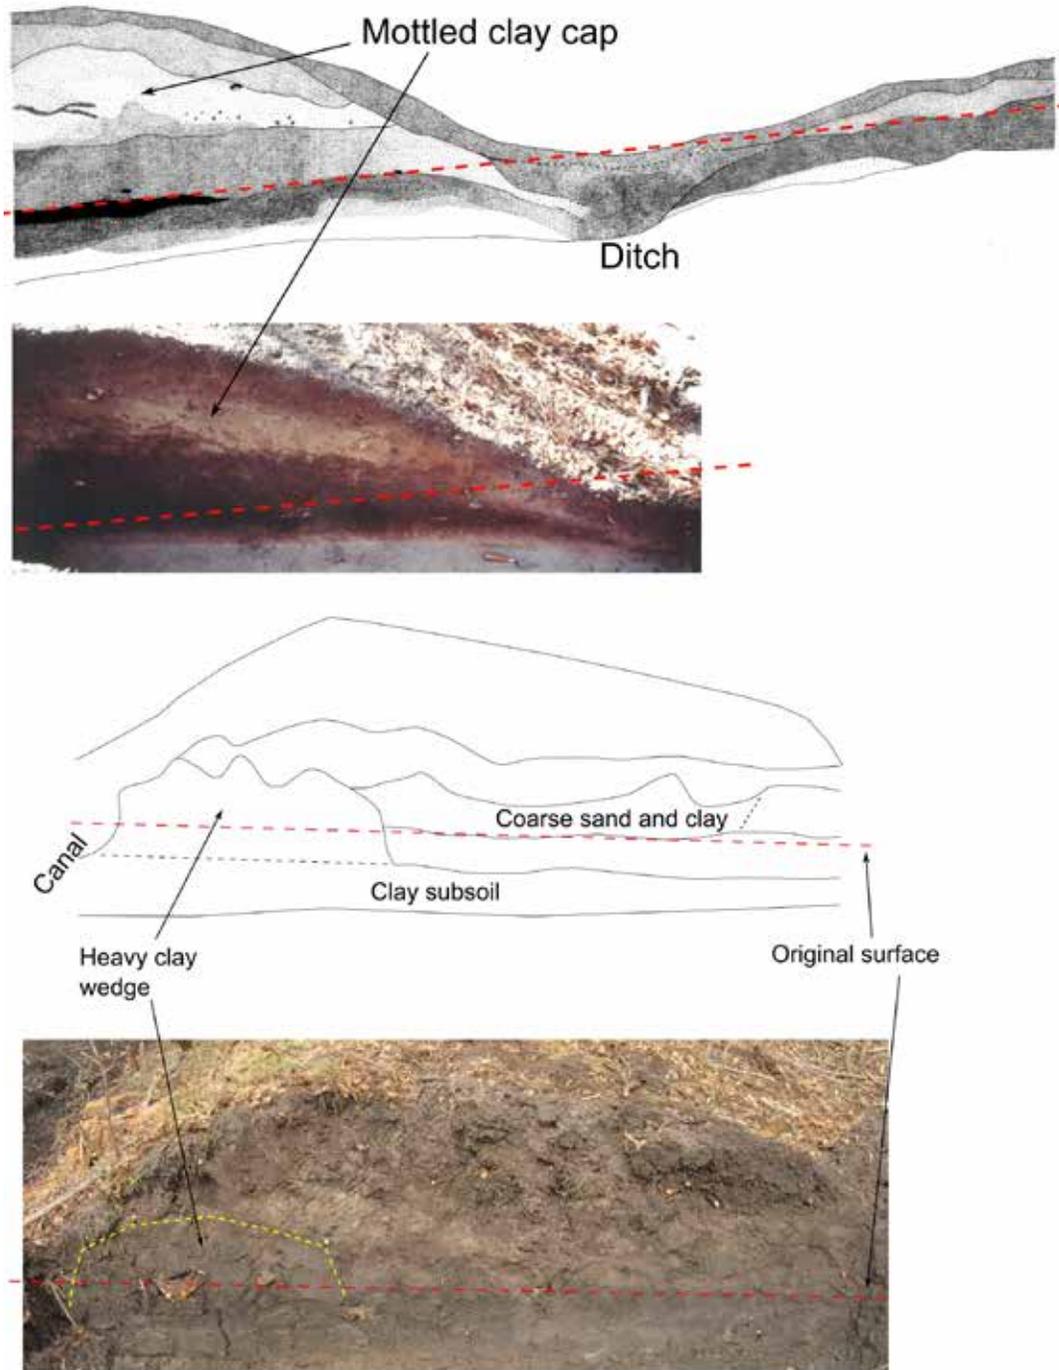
Profile drawing and photo of embankment excavation at Willtown (top), profile drawing and photo of embankment at Bluehouse Swamp (bottom).
